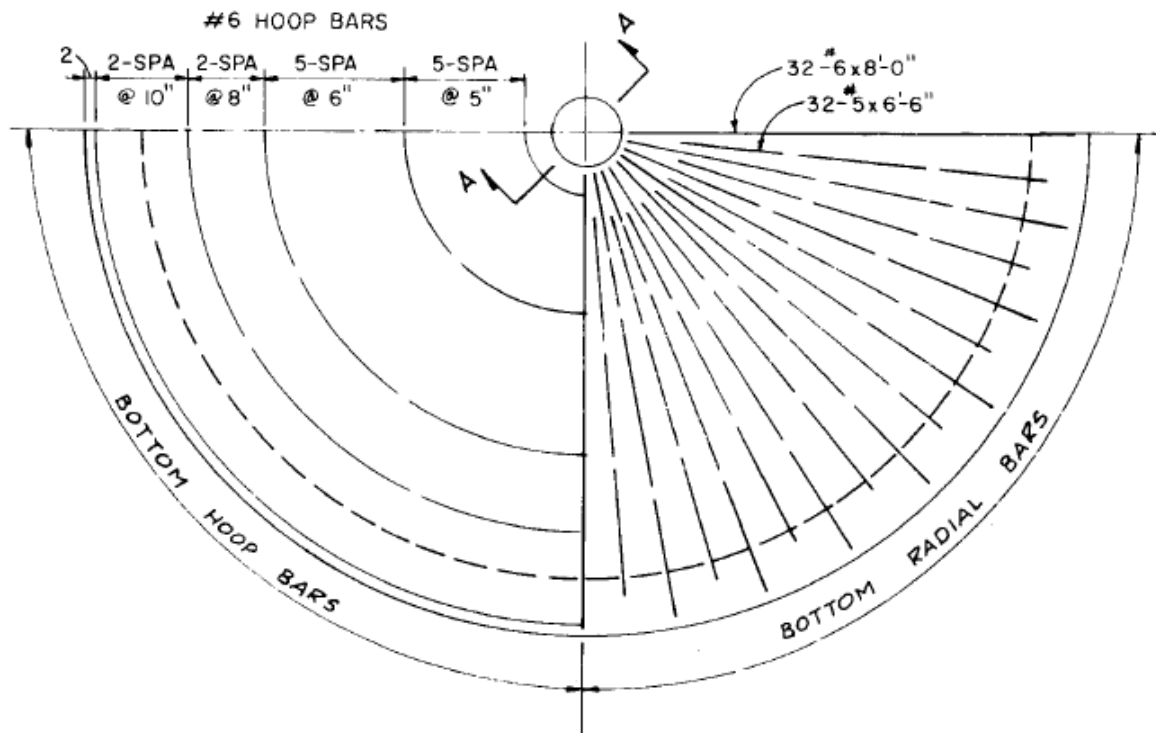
Reinforcing of silo bottom slab (Example 16-3).
